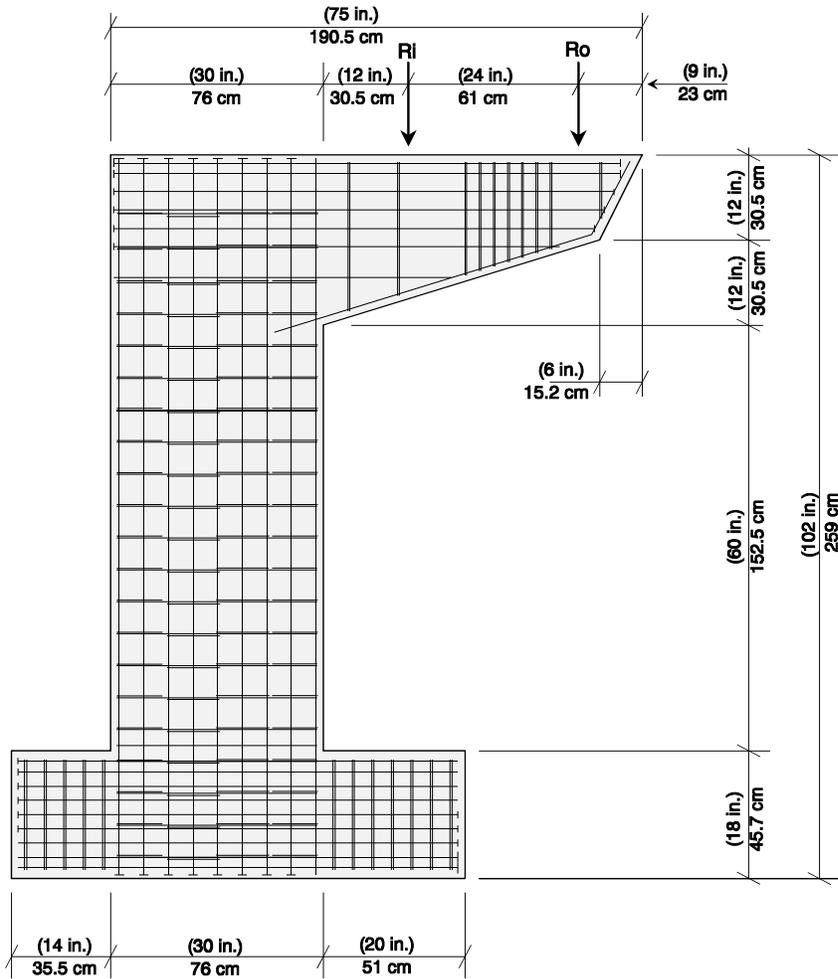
POJ-RC-100-TH complete reinforcement details
